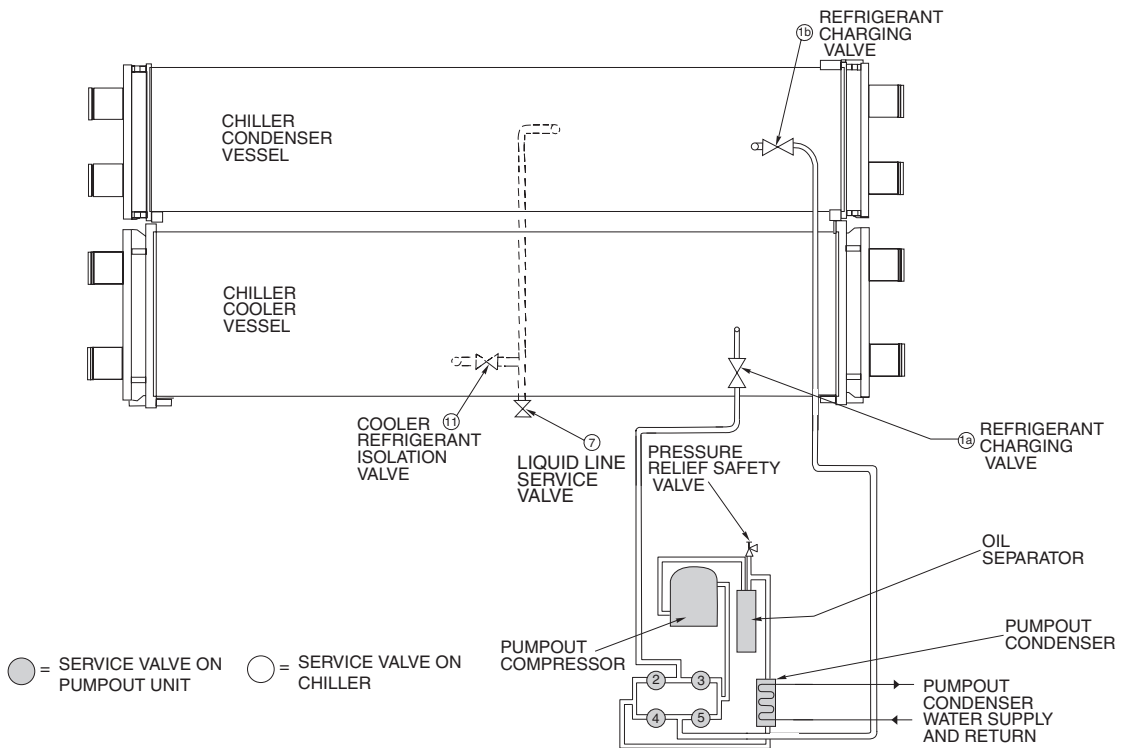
Typical Optional Pumpout System Piping Schematic without Storage Tank
